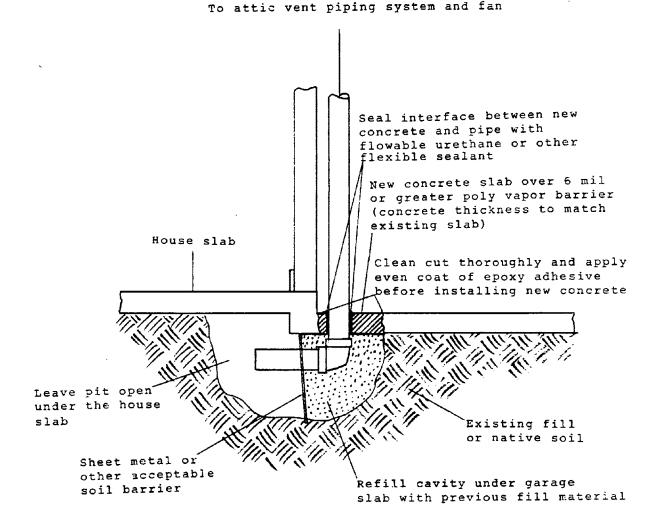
Illustration of a garage suction pipe horizontal installation into a pit under the house slab in a house where the garage slab is a step-down form pour from the house slab. If the house and garage slabs are separated by a stem wall, then the pipe goes in through that wall rather than - the sheet metal as pictured here.
